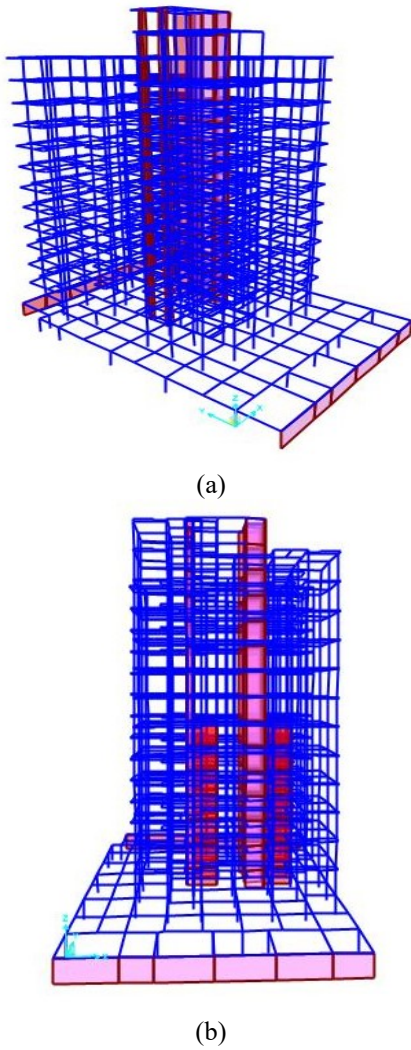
3D model of the (a) original building, and (b) Retrofitted Building using shear walls in SAP2000 [8]
